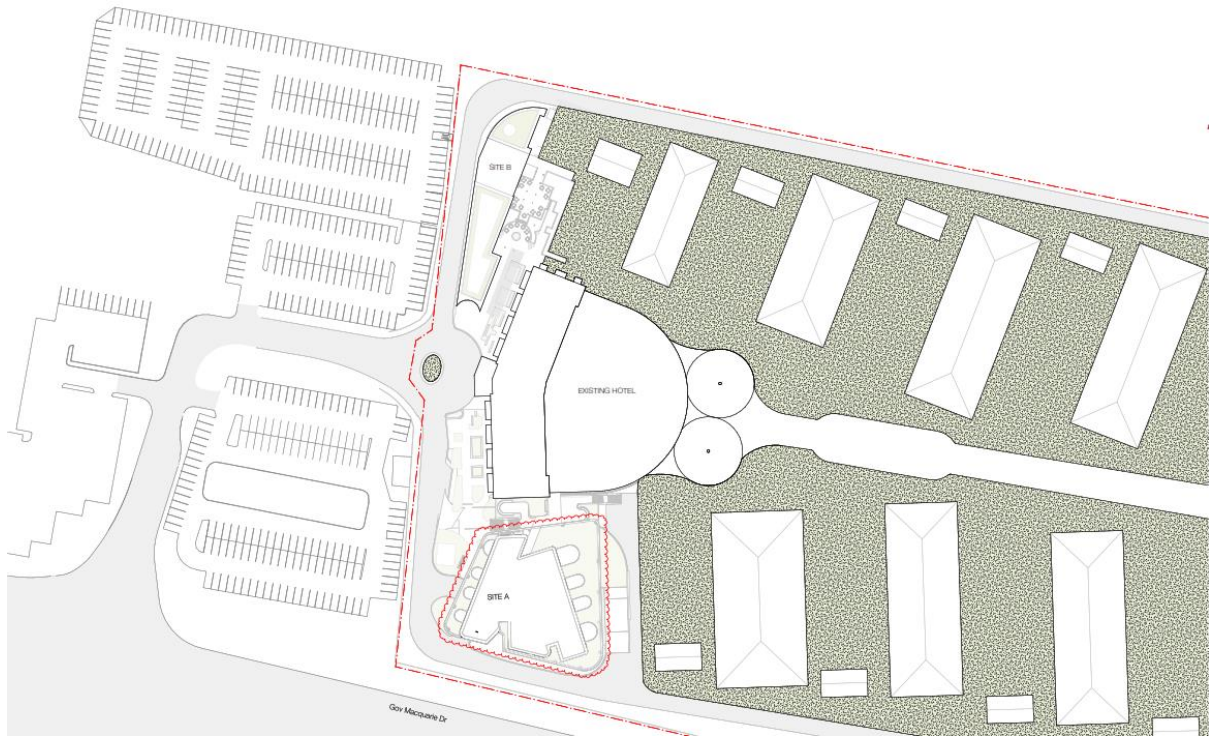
Proposed Site Plan – (Source: SJB, dated 08/11/2023)
